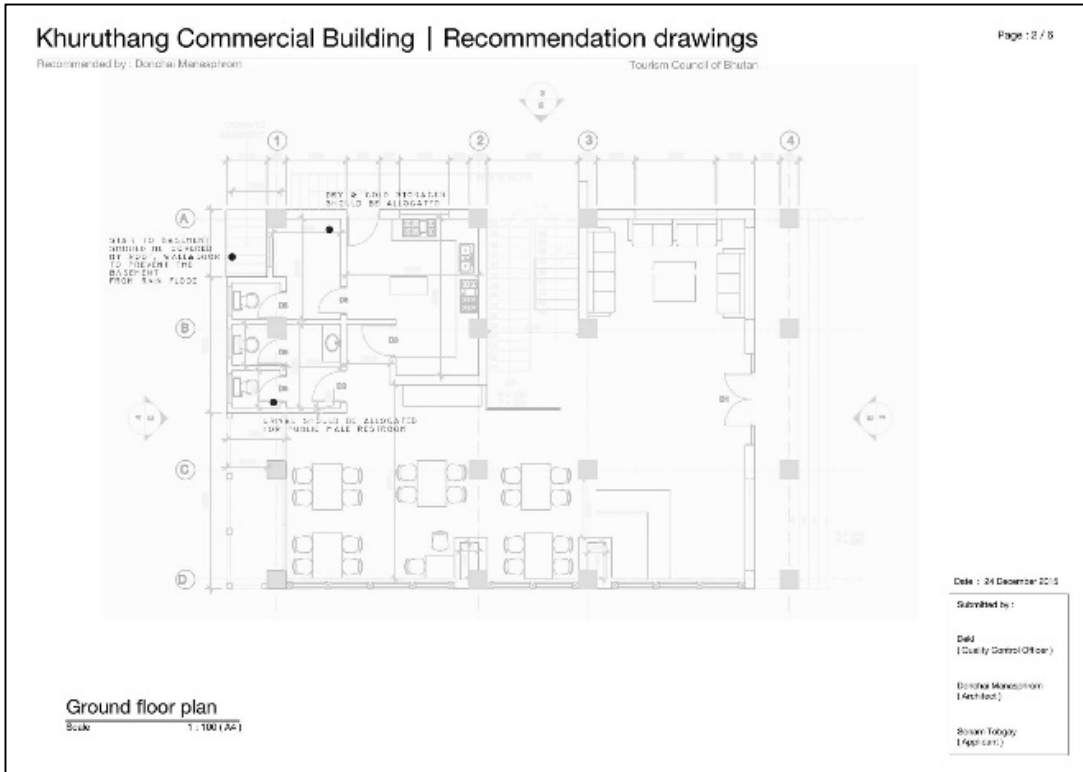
,63. Khuruthang hotel recommendation drawings – Ground floor plan
